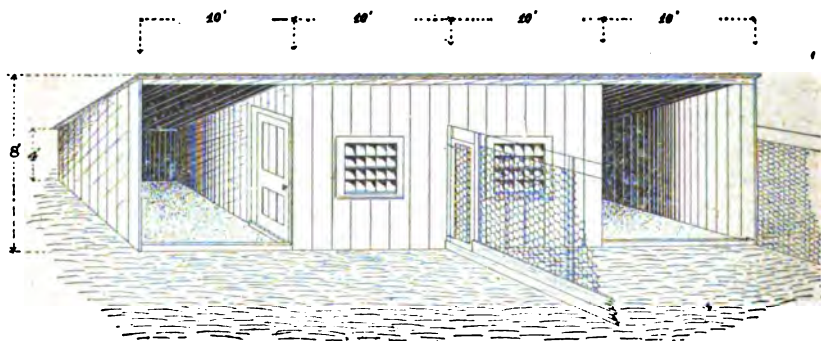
illustrates a model form of poultry building, and is with the exception of some slight details of the same construction as our main building. This house is 14 feet wide, pens 12 feet long with walls, roof, floor and windows constructed as previously described by the wall double boarded inside and out with tar paper between. The floor also double, and on the roof tar paper beneath the shingles. A four foot passage way runs throughout the rear. Access to the pens is through doors two feet wide, which open inward against a partition between the pens. This partition is matched stuff for 2 feet and then wire netting up to the ceiling. The arrangements of the roosts (R), the drop boards (D. B.), the nest boxes (N. B.) and the feed board are very simple. The fowls are fed their soft feed through the slatted front of the pen upon the hinged feed door, which when not in use, is hooked in a perpendicular position. These slats are three inches apart and fourteen inches high. Immediately above upon a platform 20 inches wide, the nest boxes are placed facing the passageway. Eggs are gathered from them by opening the hinged door in the passageway which extends in front of the platform. Nests are best made of  $\frac{1}{2}$  inch lumber, boxes 12x12x14 inches dimension. Above the nest boxes is another platform 22 inches wide which catches the droppings from the roosts. This drop board (D. B.) extends about 1 $\frac{1}{2}$  inches into the passageway so that in cleaning the edge a pail may catch under it. The roosts are placed 6 inches above the drop boards and are 2x3 $\frac{1}{2}$  inches with corners rounded off and the flat side up. (V) Ventilator is placed in the corner of the pen close to the passageway, and the damper is operated therefrom. The exit through the floor is surrounded by a box as shown. This is to prevent litter from falling through. The front wall is inclined inward two feet at the top in order to take greater advantage of the sunlight, and the building is sealed with matched flooring upon the lower side of the collar beam. Where it is intended to keep only 40 or 50 birds, a saving of space may be affected by running the
